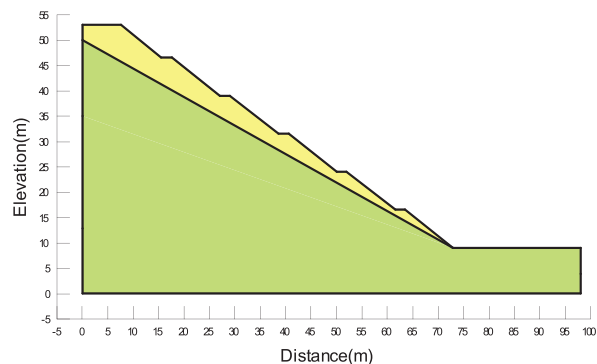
Typical Cut Slope Geometry - 1:1.267 cut slope
